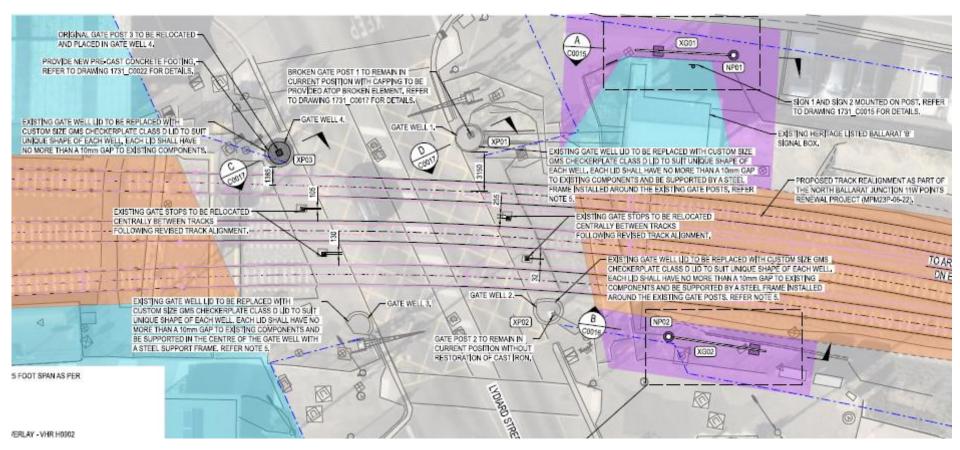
Detail from General Arrangement Plan showing proposed works to Lydiard Street North level crossing Source: 1731_C0011, Revision C, 2 July 2024
